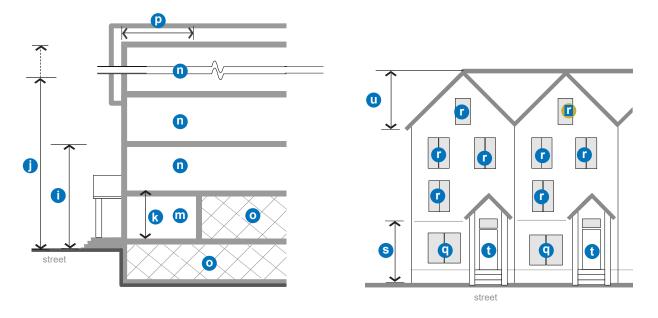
(D)(2) Townhome Building: Height and Use Requirements
